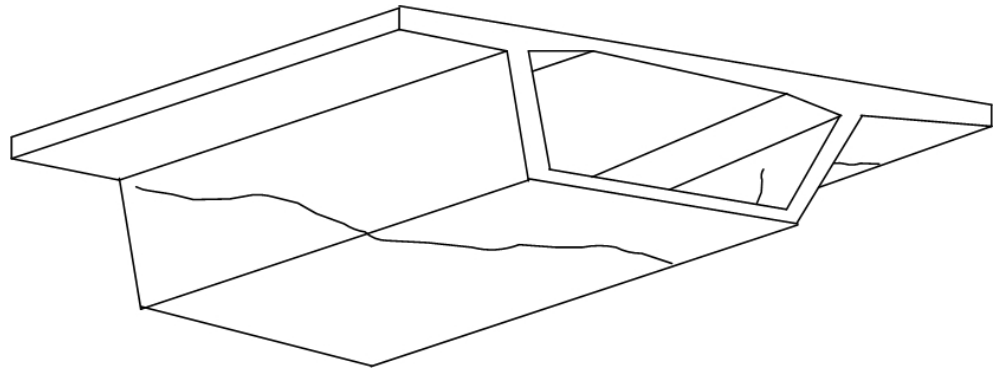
Box Girder Cracks Induced by Torsion and Shear
